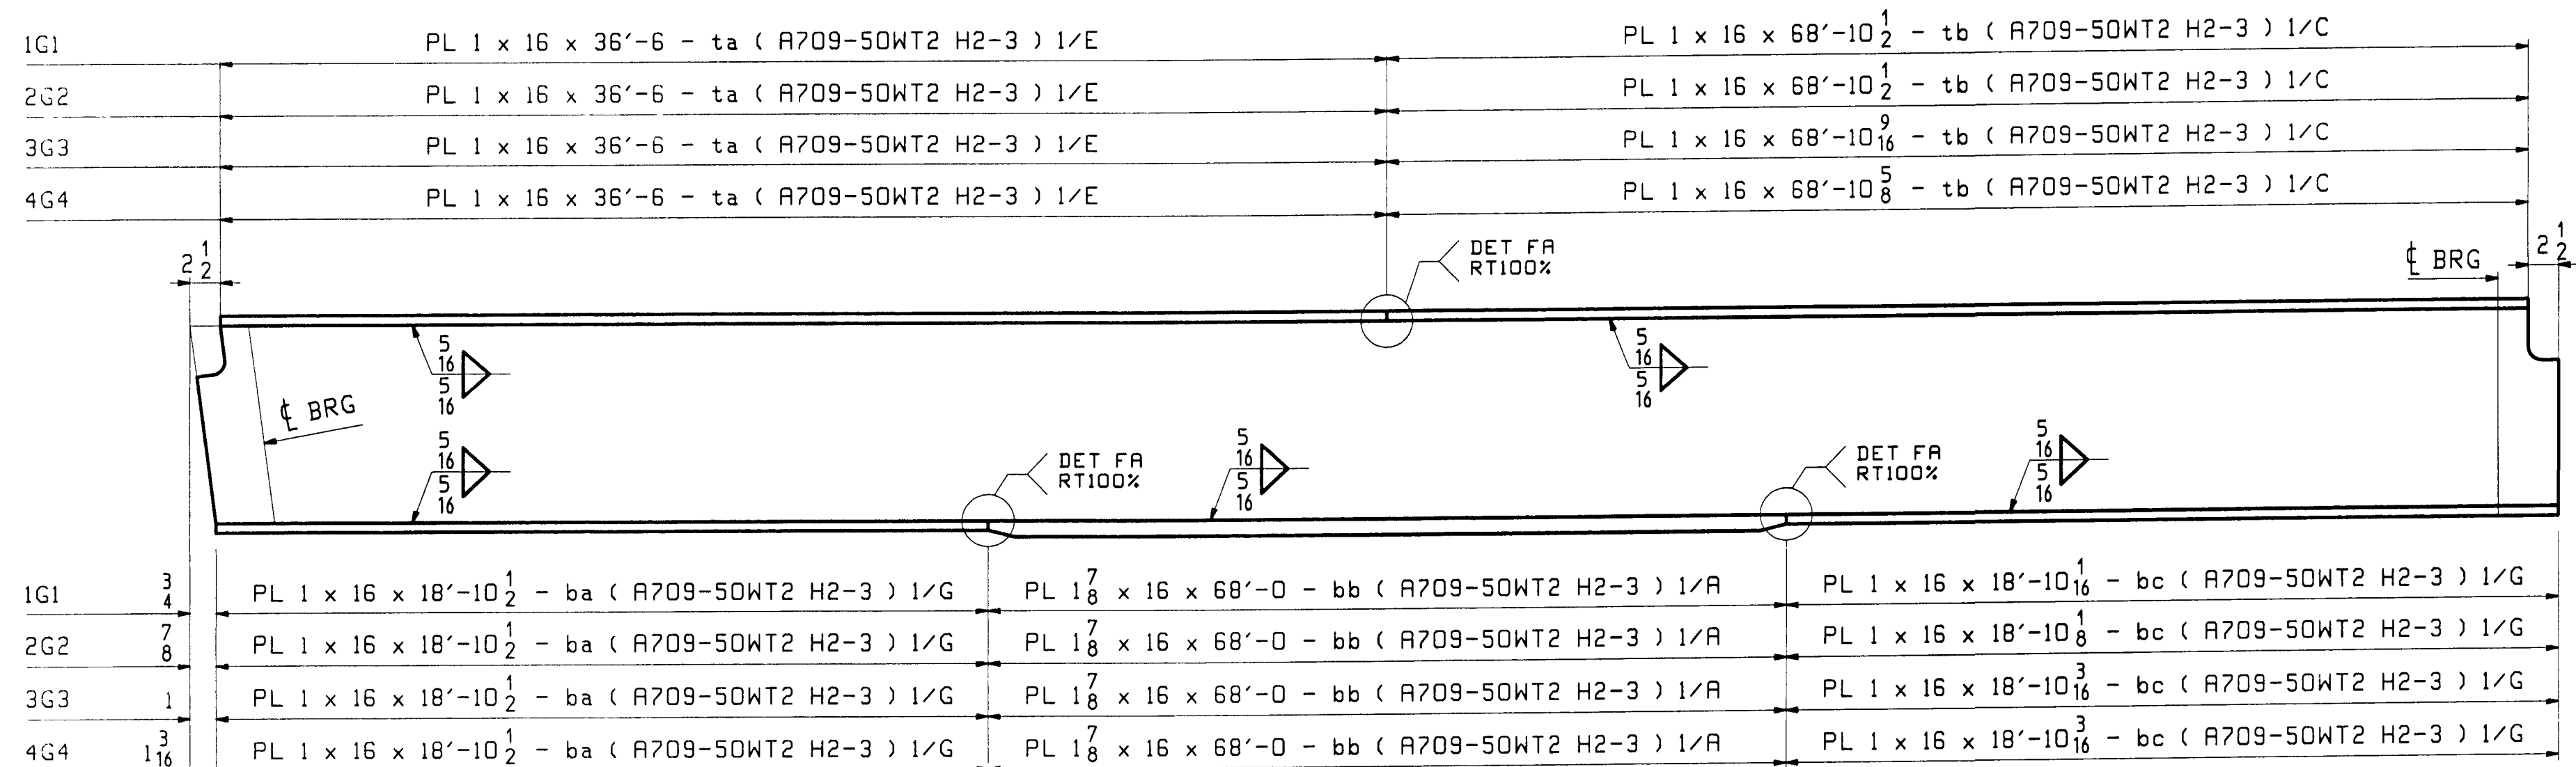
DETAIL RIGHT END AT 3G3 & 4G4 ONLY
